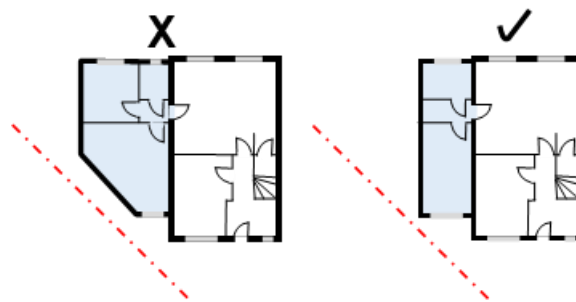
Side walls of extensions should remain parallel with the original house.
